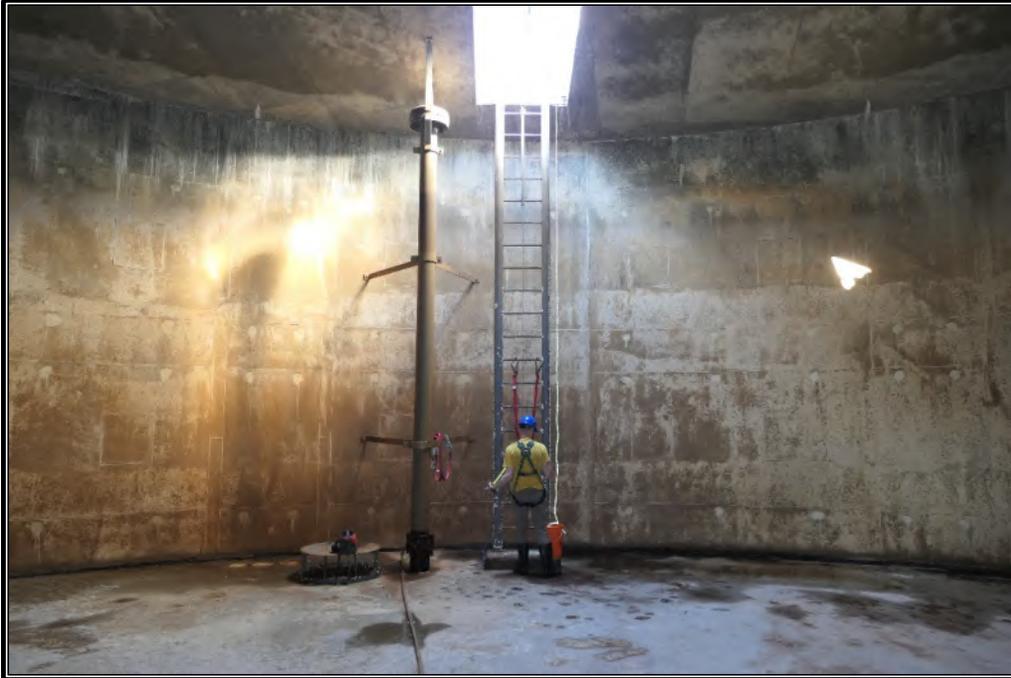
Dakin 2 - Entry Ladder, Overflow, and Inlet/Outlet/Drain
